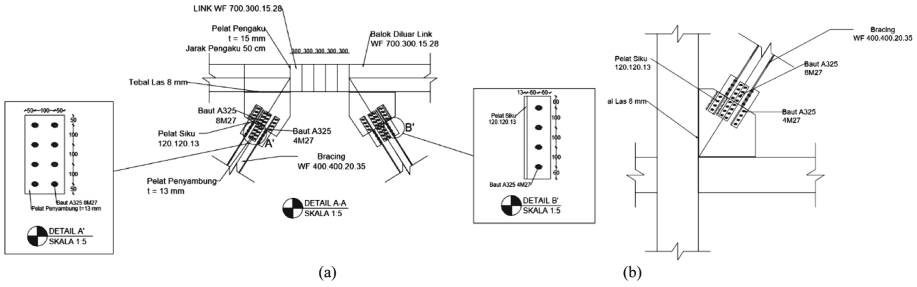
(a) Connection between bracing and beam (B) Connection between bracing and column
